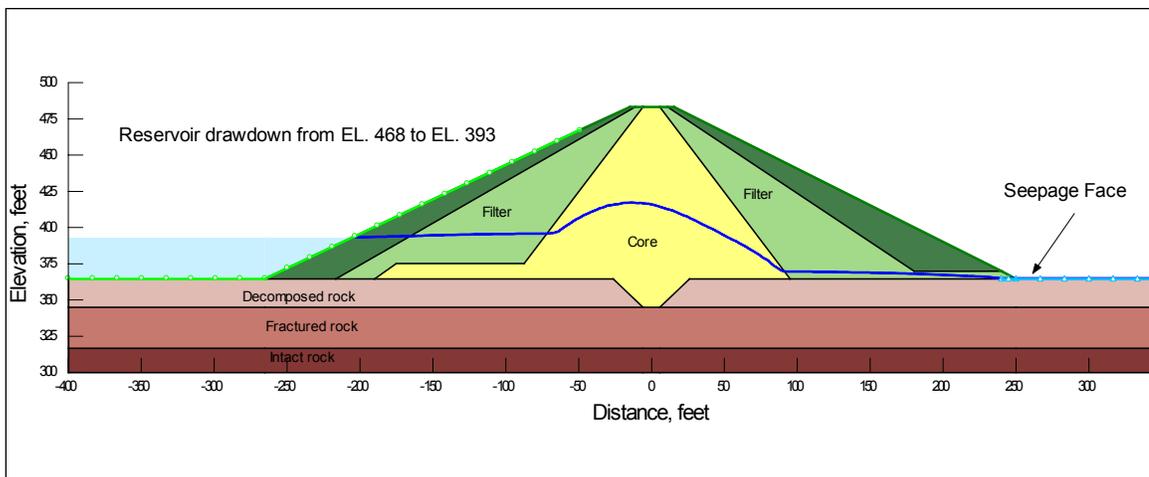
Reservoir drawdown from elevation 468 to elevation 393.
